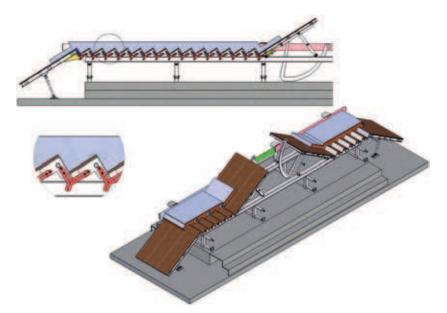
Platform staircase formwork for facing concrete elements (negative process)
